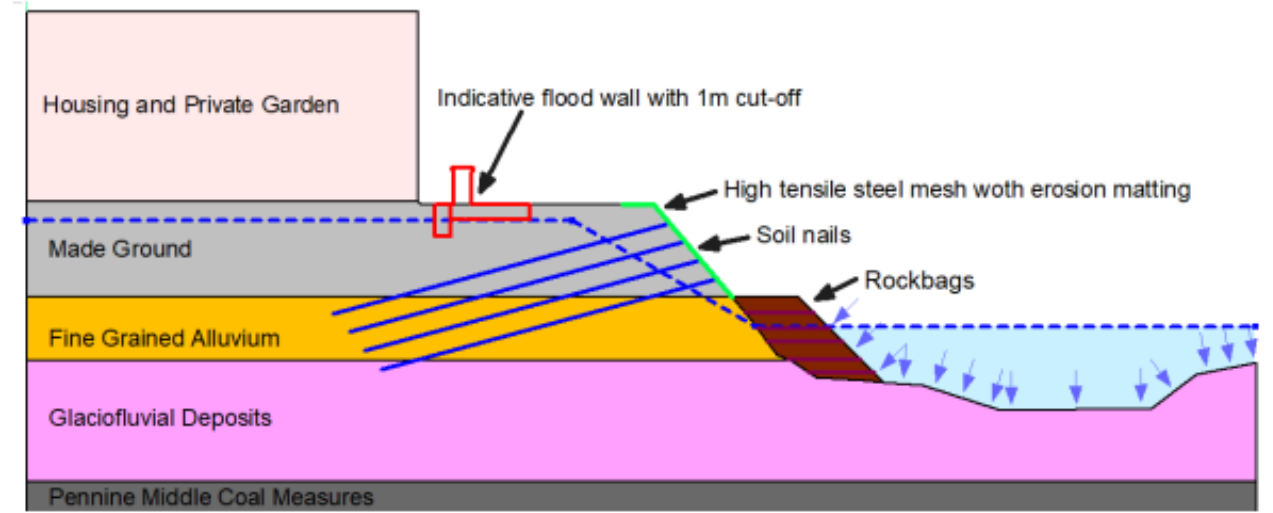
Schematic of proposed flood defence and riverbank stabilisation measures (Not to scale).
